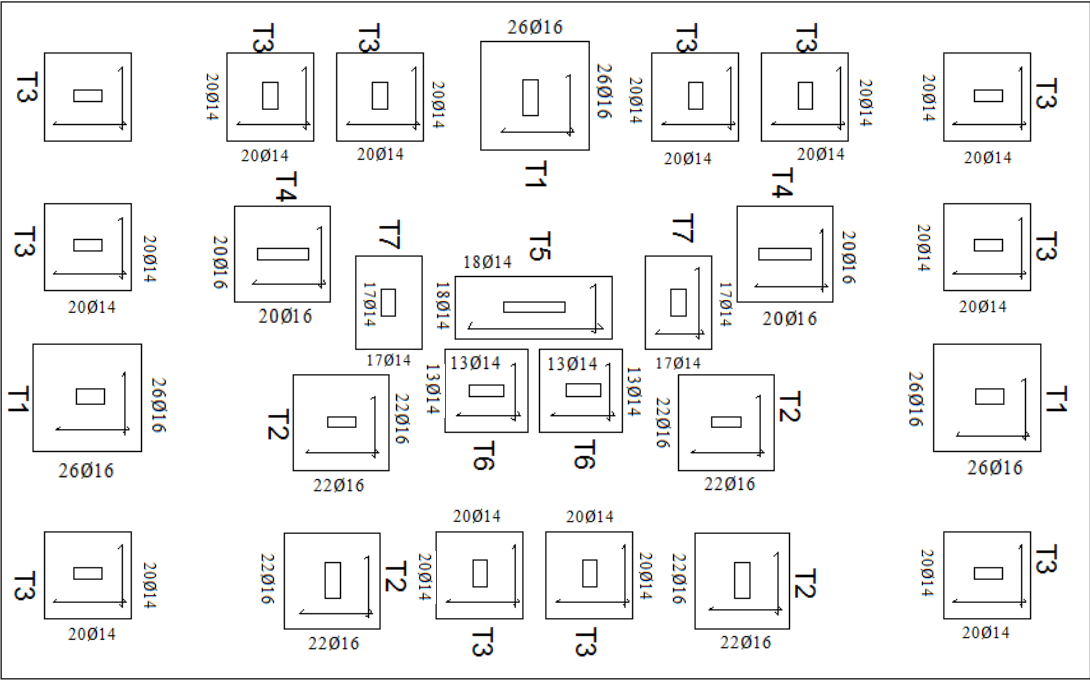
Reinforcement rebar of foundation of studied building (T1, T2, T3, T4, T5, T6 and T7)
